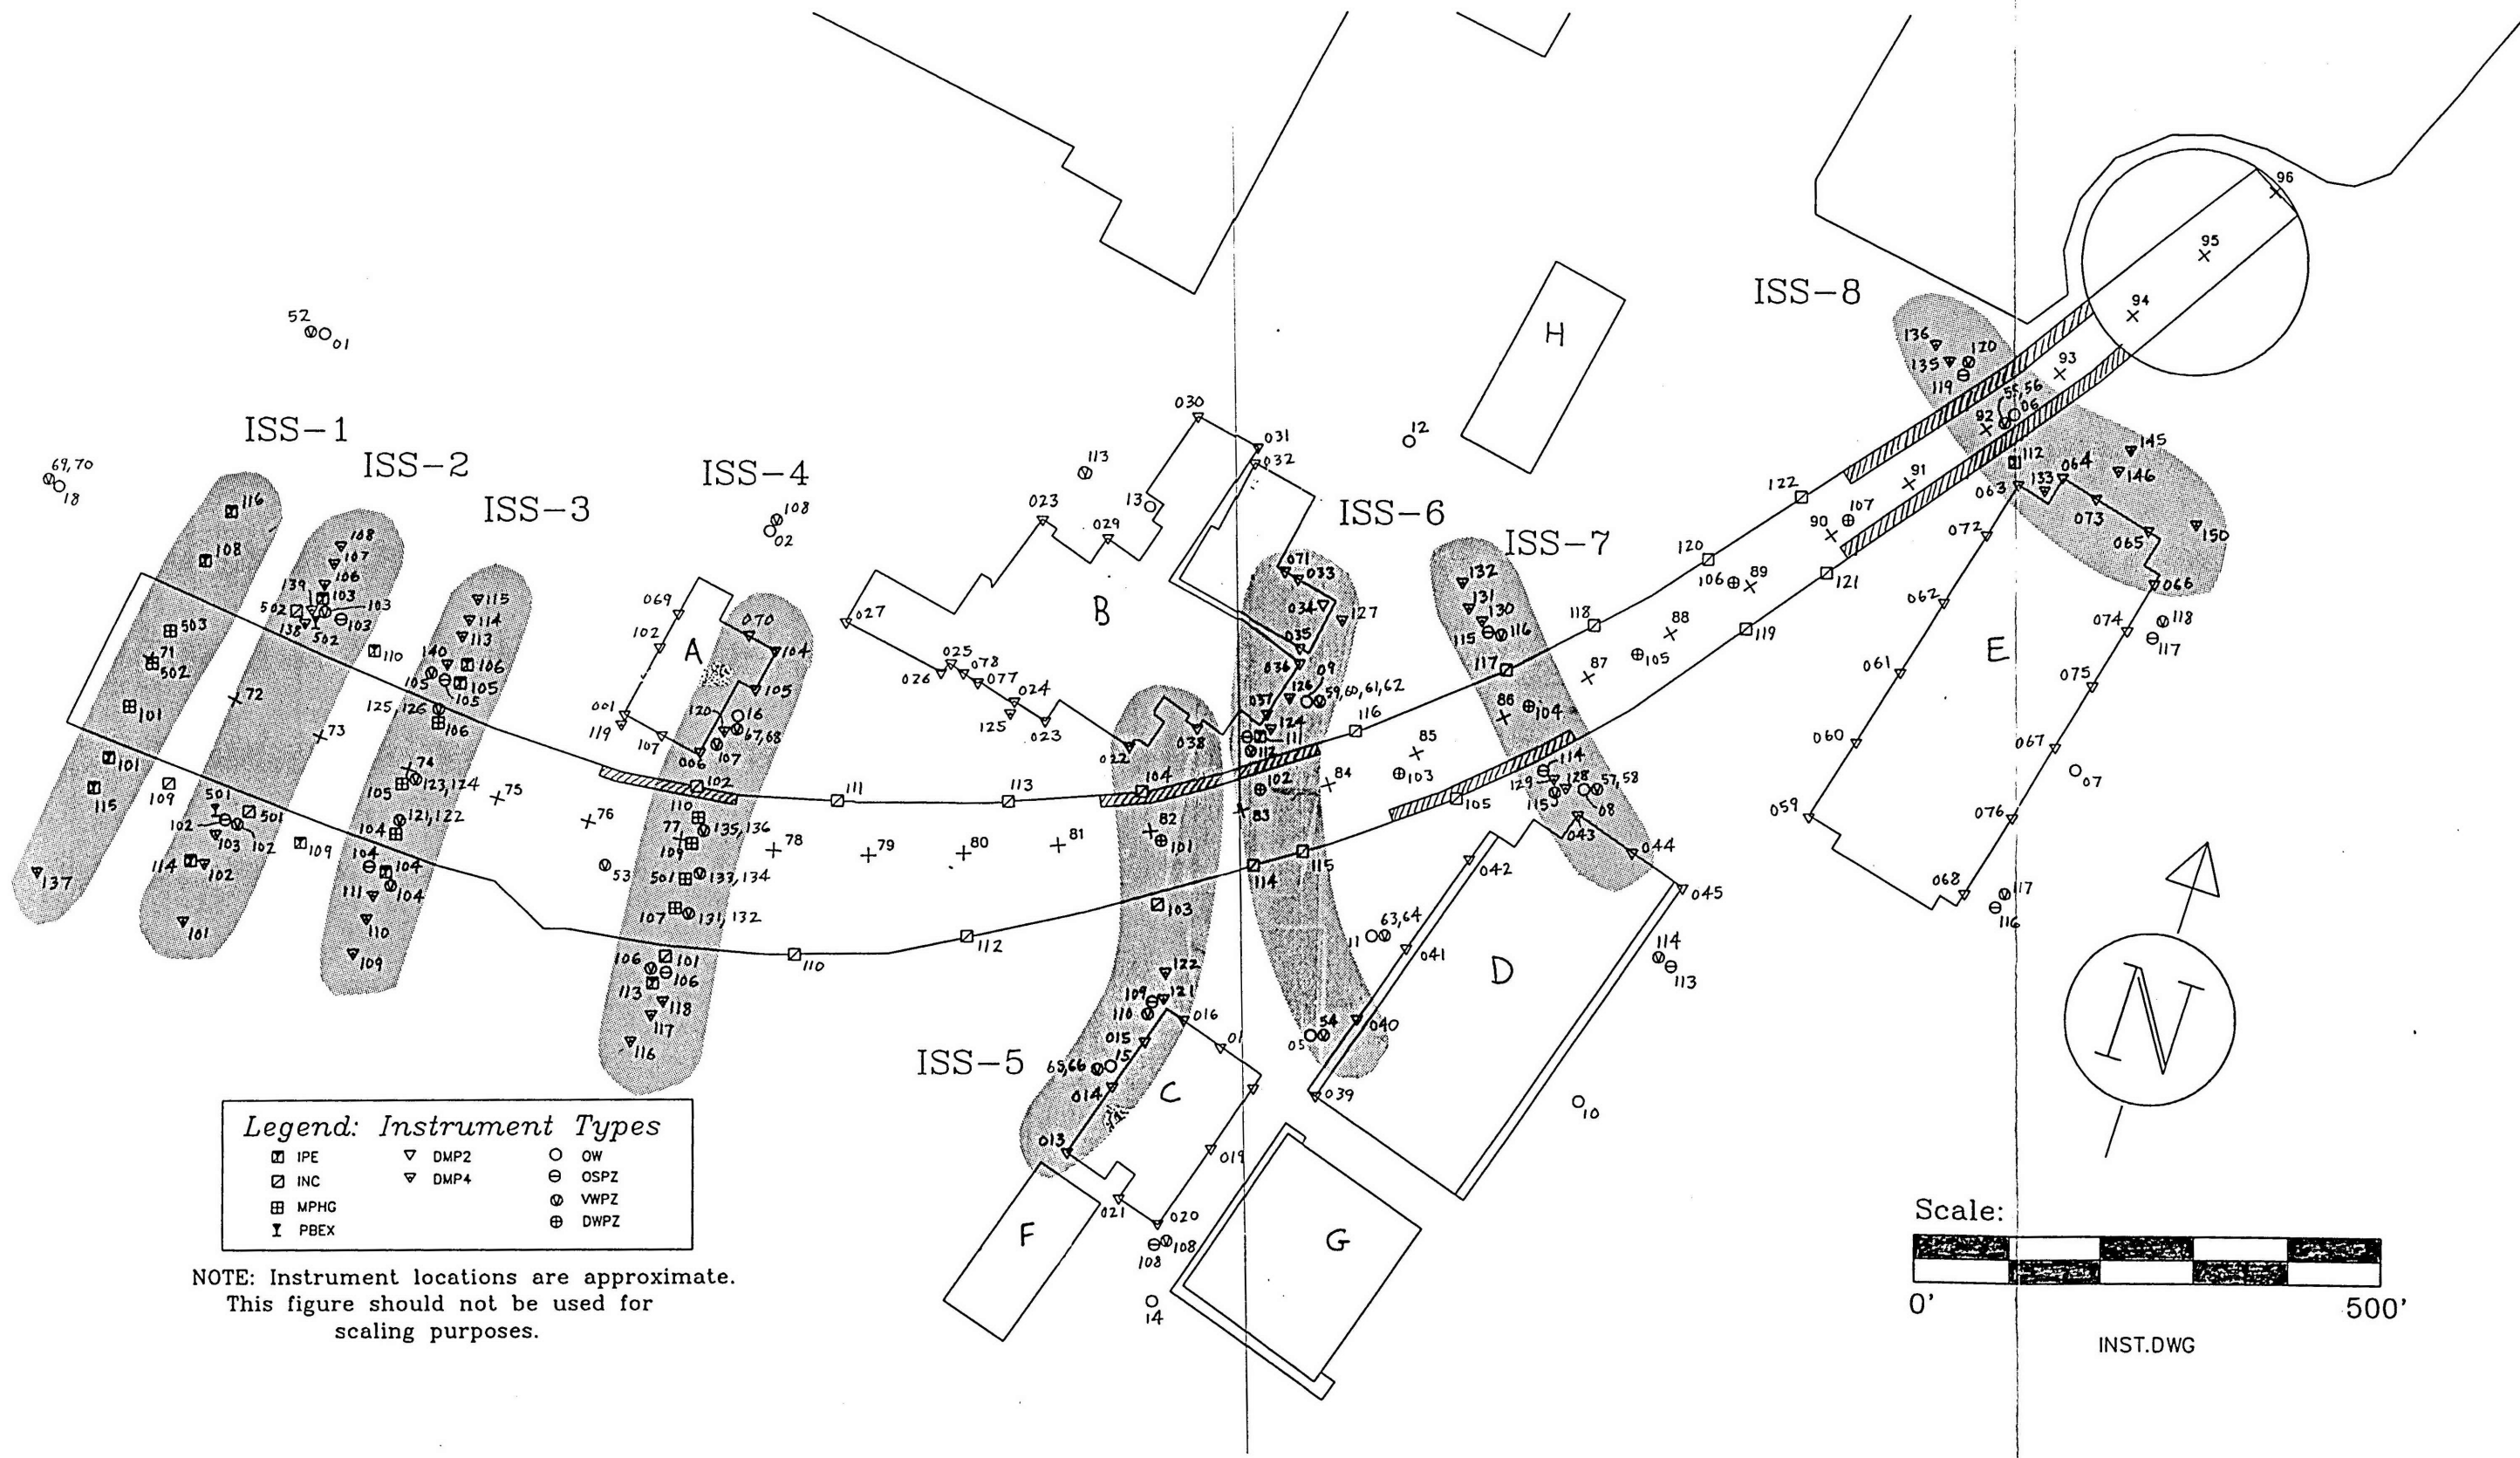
Plan View of the Excavation, showing Positions of Geotechnical Instrumentation and Instrumented Sections.
